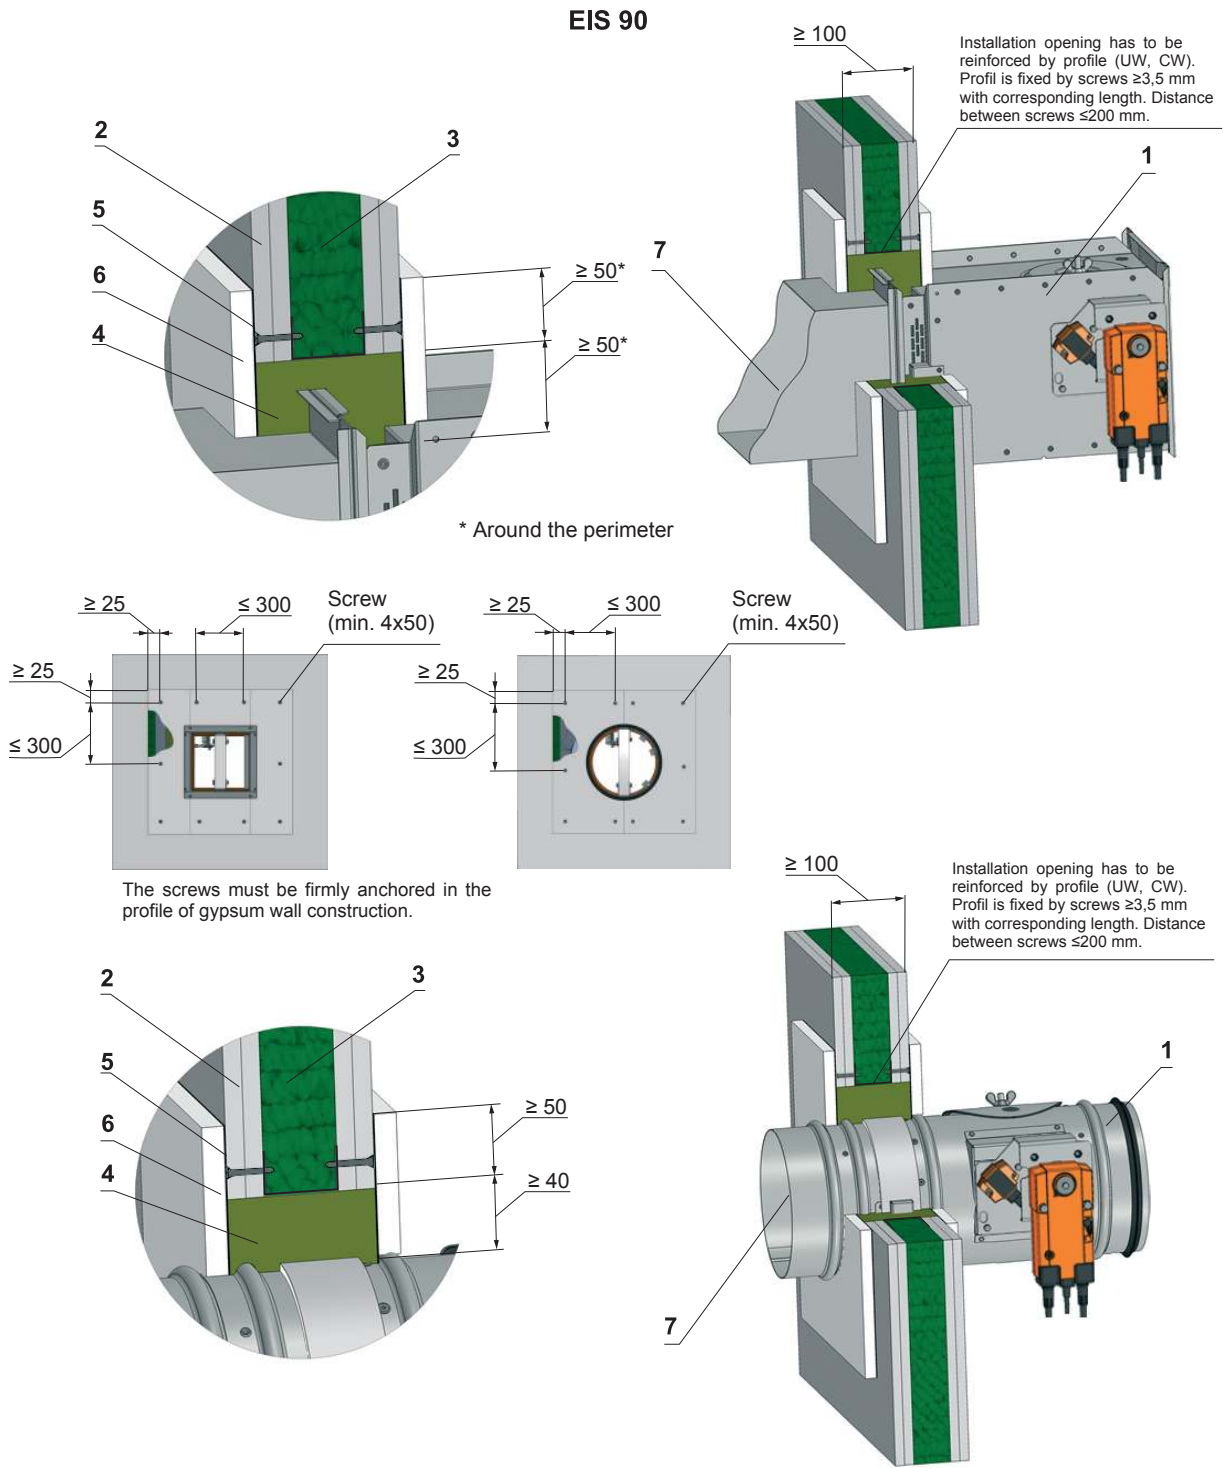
Gypsum wall construction - stuffing box, fire protection mastic and cement lime plate
